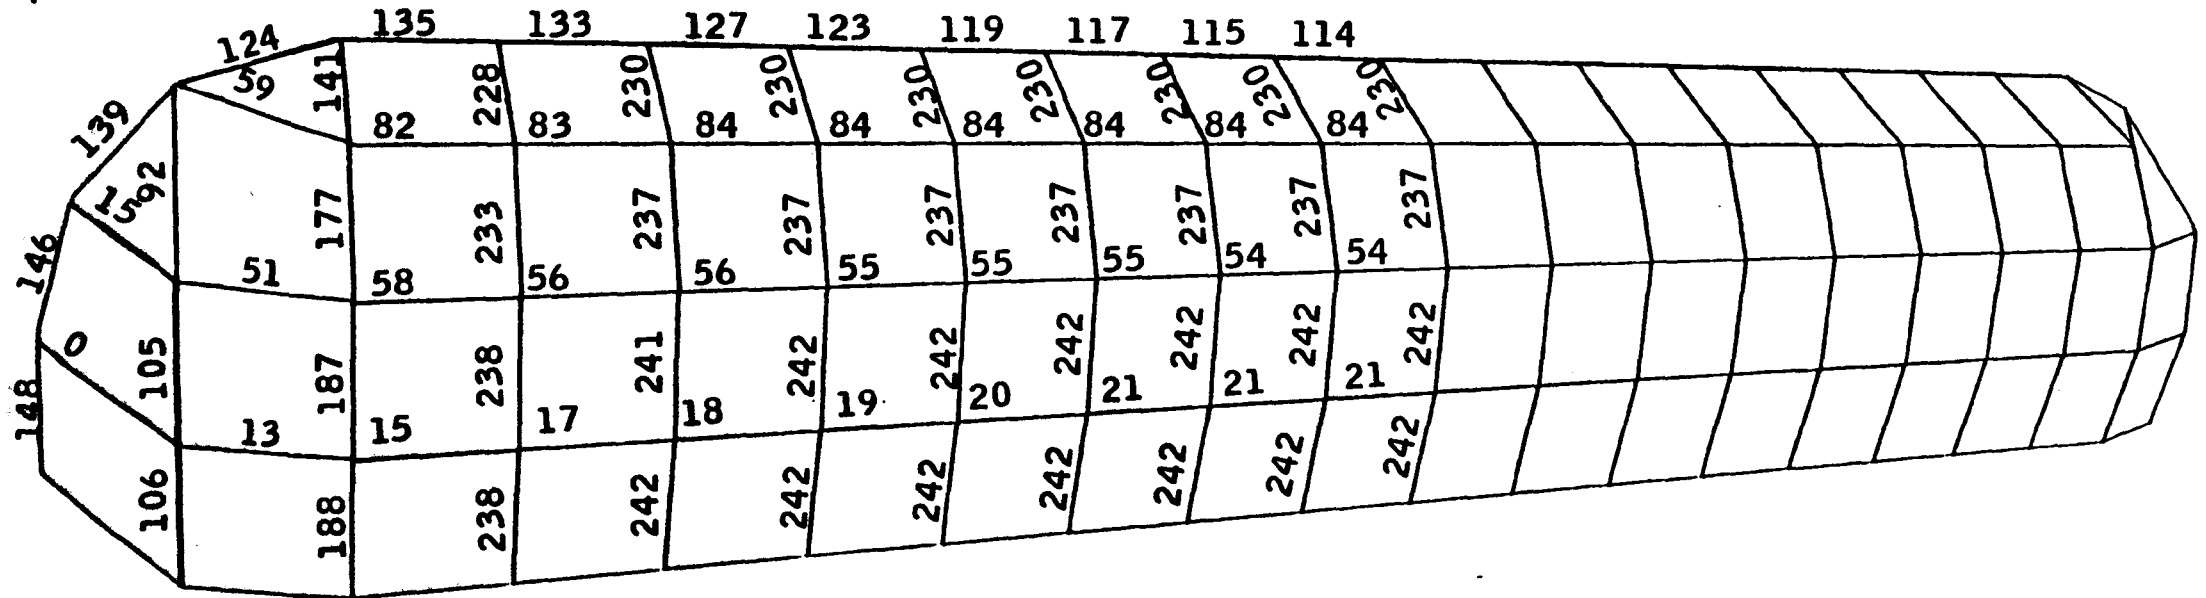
a2 - Tension forces in the cables (in kN).
